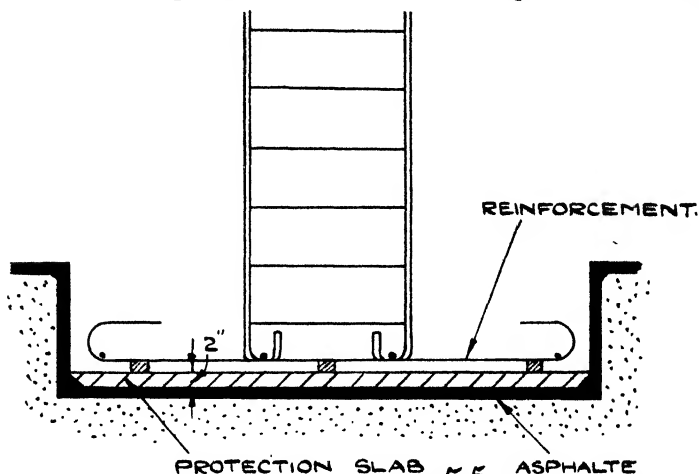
PROVISION OF PROTECTION SLAB UNDER REINFORCEMENT
